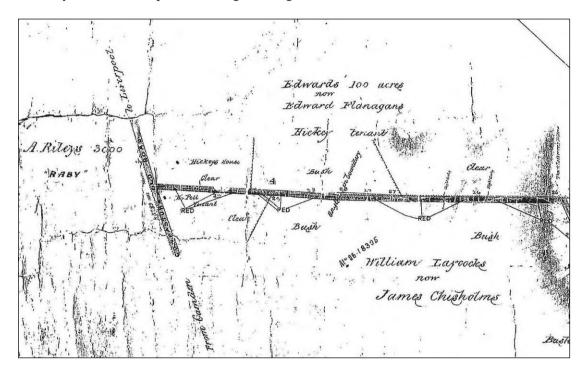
Detail of an 1867 plan showing parts of Portion 1 of the Parish of Minto and Portion 46 of the Parish of Narellan (source: Plan of a road from the Campbell Town Road to the Cowpasture Old Road in the Parishes of Minto and Narellan County of Cumberland to be proclaimed as a Parish Road under the Act of Council 4 Wm No. 11. LPMA CP 753.1603).
